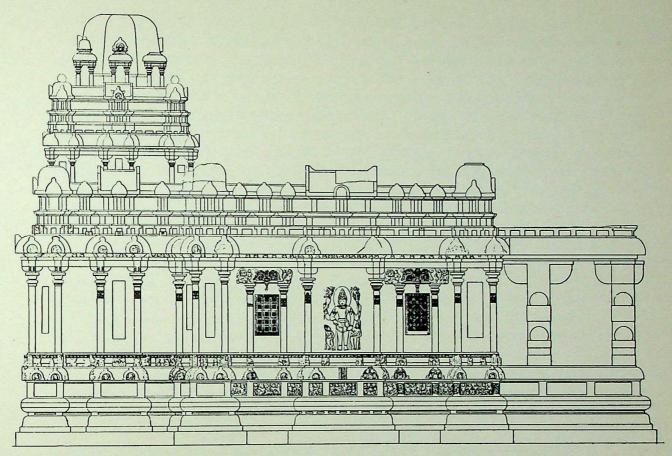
Bādāmi. Mālegitti Śivālaya temple, elevation. (After Cousens.)
